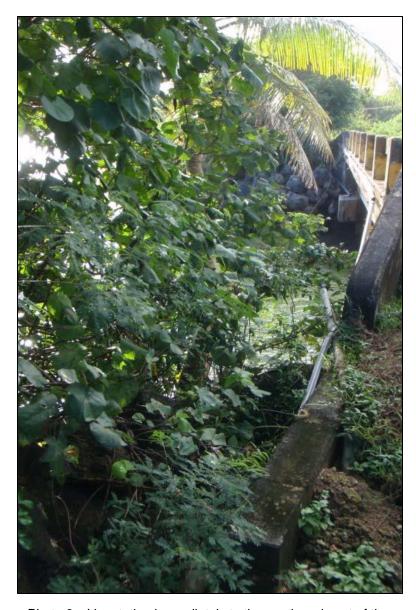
Vegetation immediately to the south and east of the east Ajayan Bridge abutment
